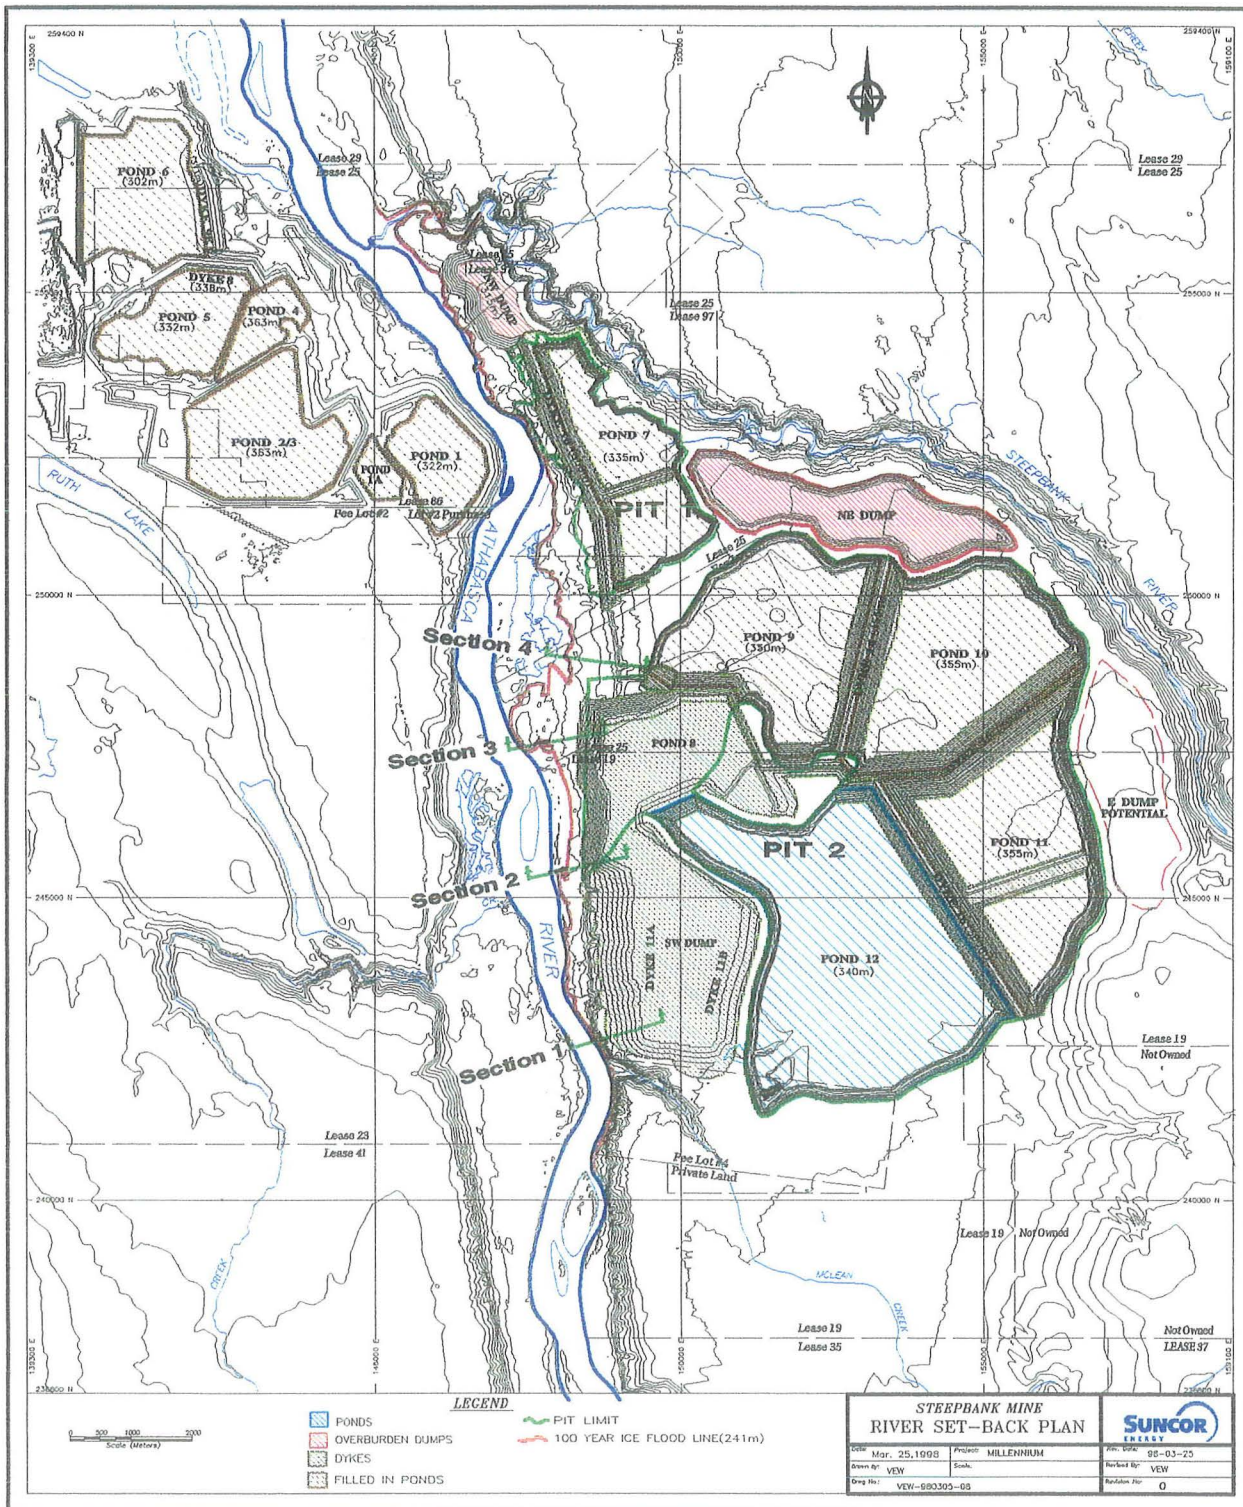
RIVER SET-BACK CROSS-SECTION KEY
